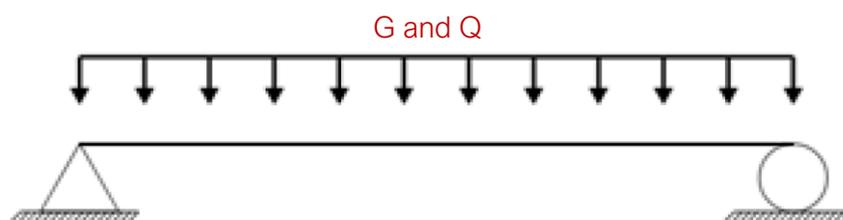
Gravity loads on Red Stag Vertix and GLT_h ridge beam.
